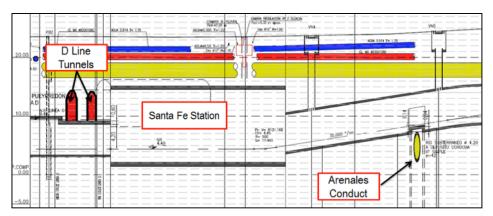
Santa Fe Station and interferences at the North (Arenales Conduct) and South (D line Tunnels).
